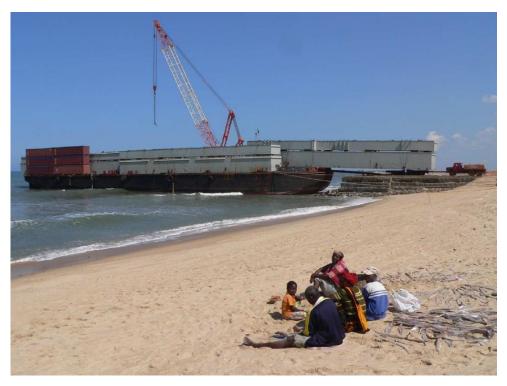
Typical beach landing site with barge offloading heavy equipment (source: Comarco)
